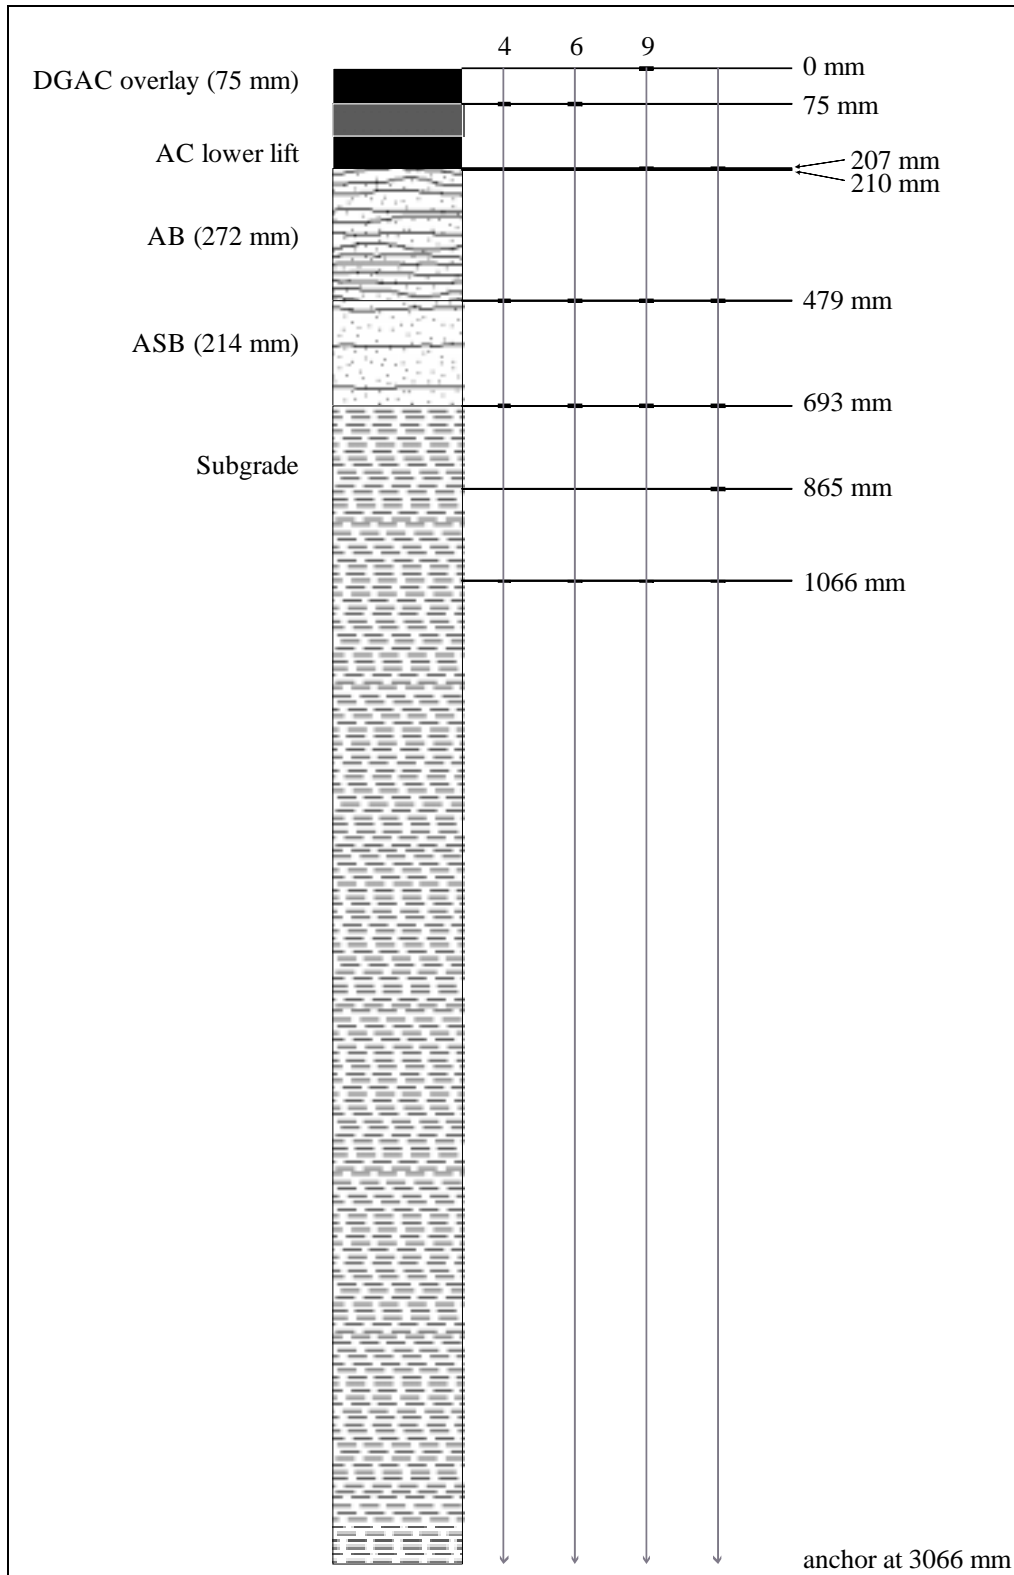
Installation depths for MDDs in Section 517 (undrained, DGAC overlay).
